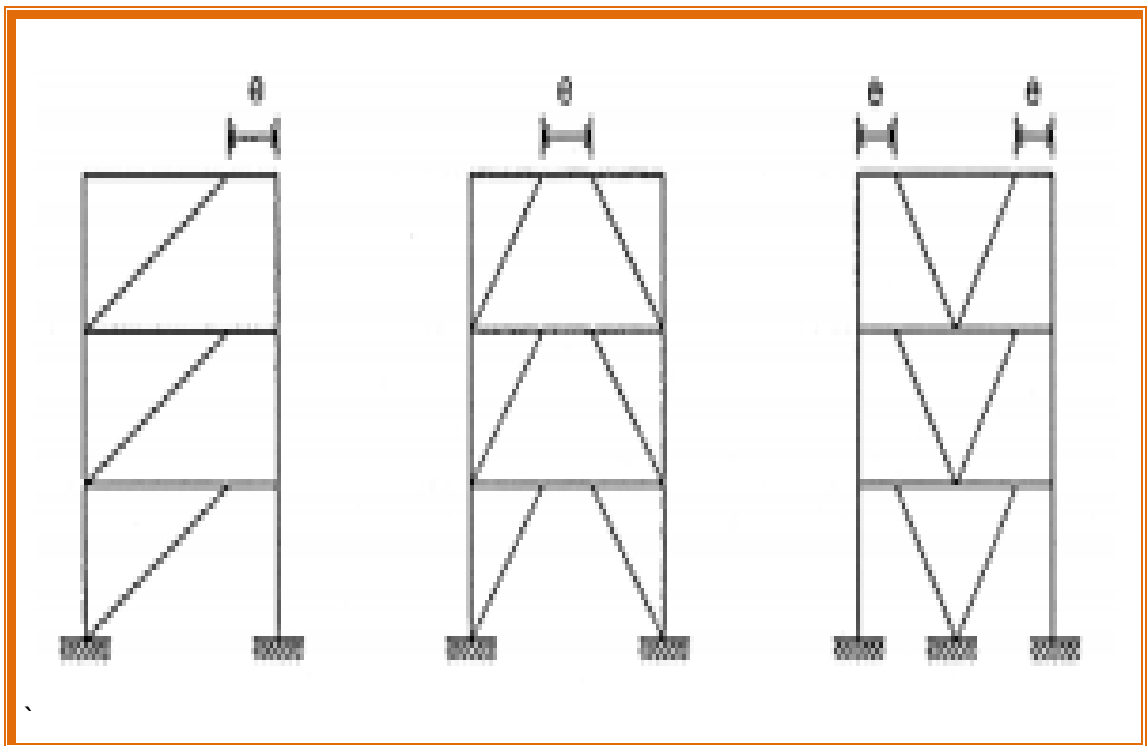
Typical Eccentric Bracing System configuration (Uang C-M., 1998)
